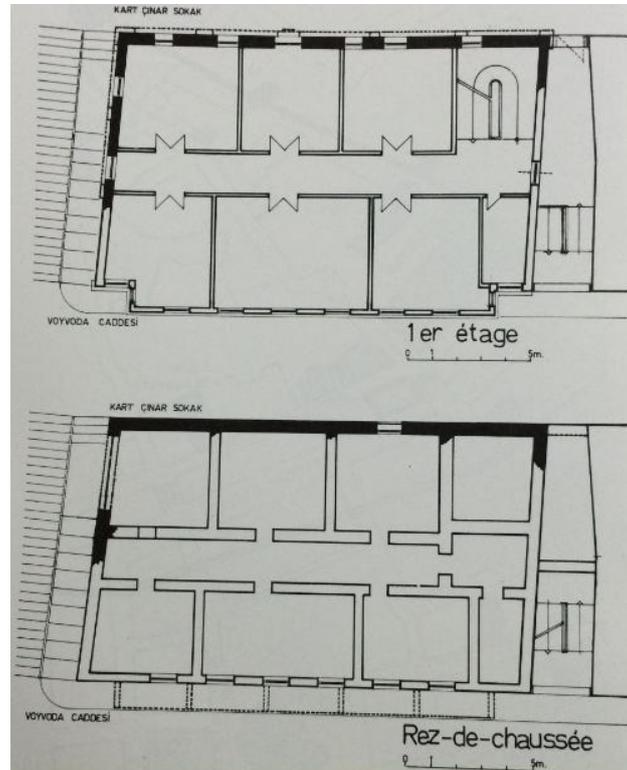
Schematic ground and first floor plans of Bereket Han to indicate the remained bearing walls of *Palazzo Comunale* after the demolition (Eyice, 1982, Pl. II)
